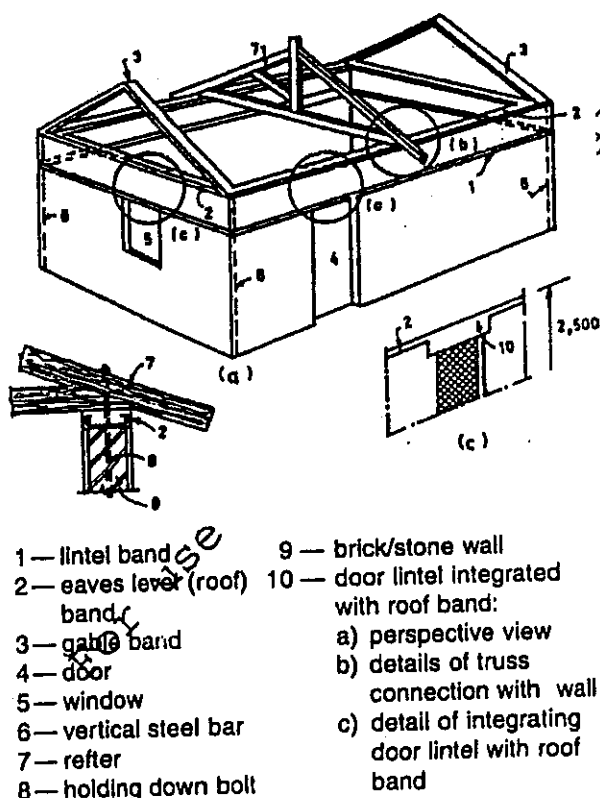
OVERALL ARRANGEMENT OF REINFORCING LOW STRENGTH MASONRY BUILDING HAVING PITCHED ROOF
